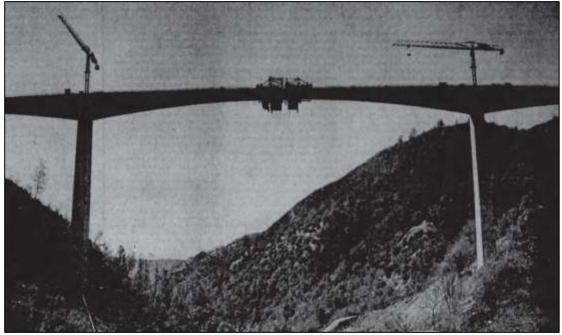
Parrotts Ferry Bridge main span nearing completion in 1979.⁴
